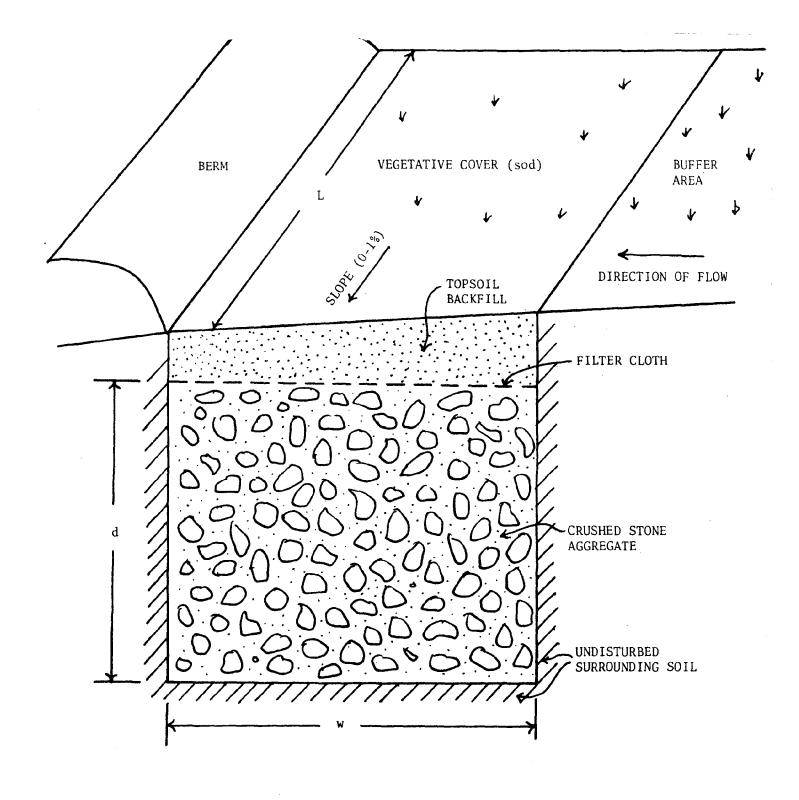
Infiltration Trench Configuration for Controlling Storm Runoff
